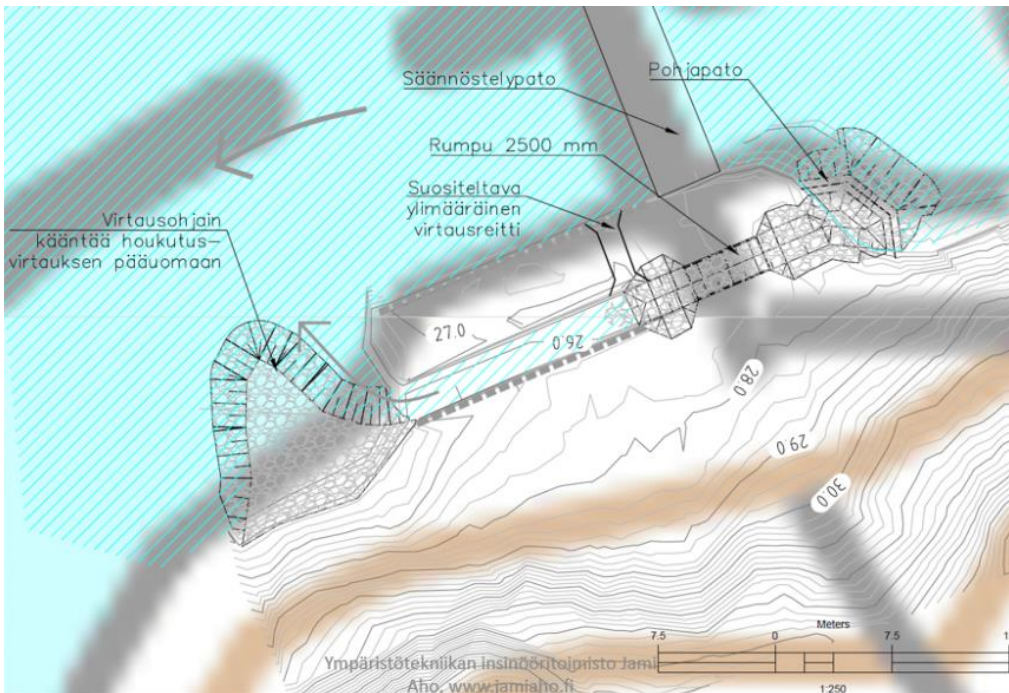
Fishway plan for the Hålldam Dam. (Jami Aho)
